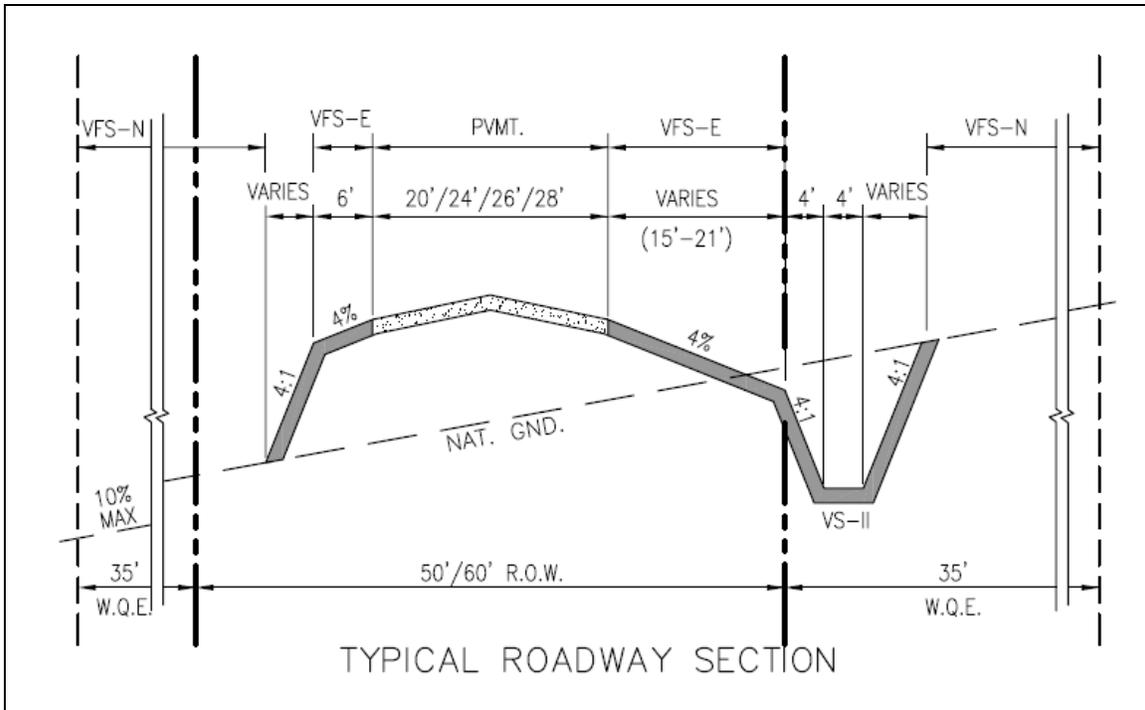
Detail of Road Section Showing Vegetated Treatment Areas
